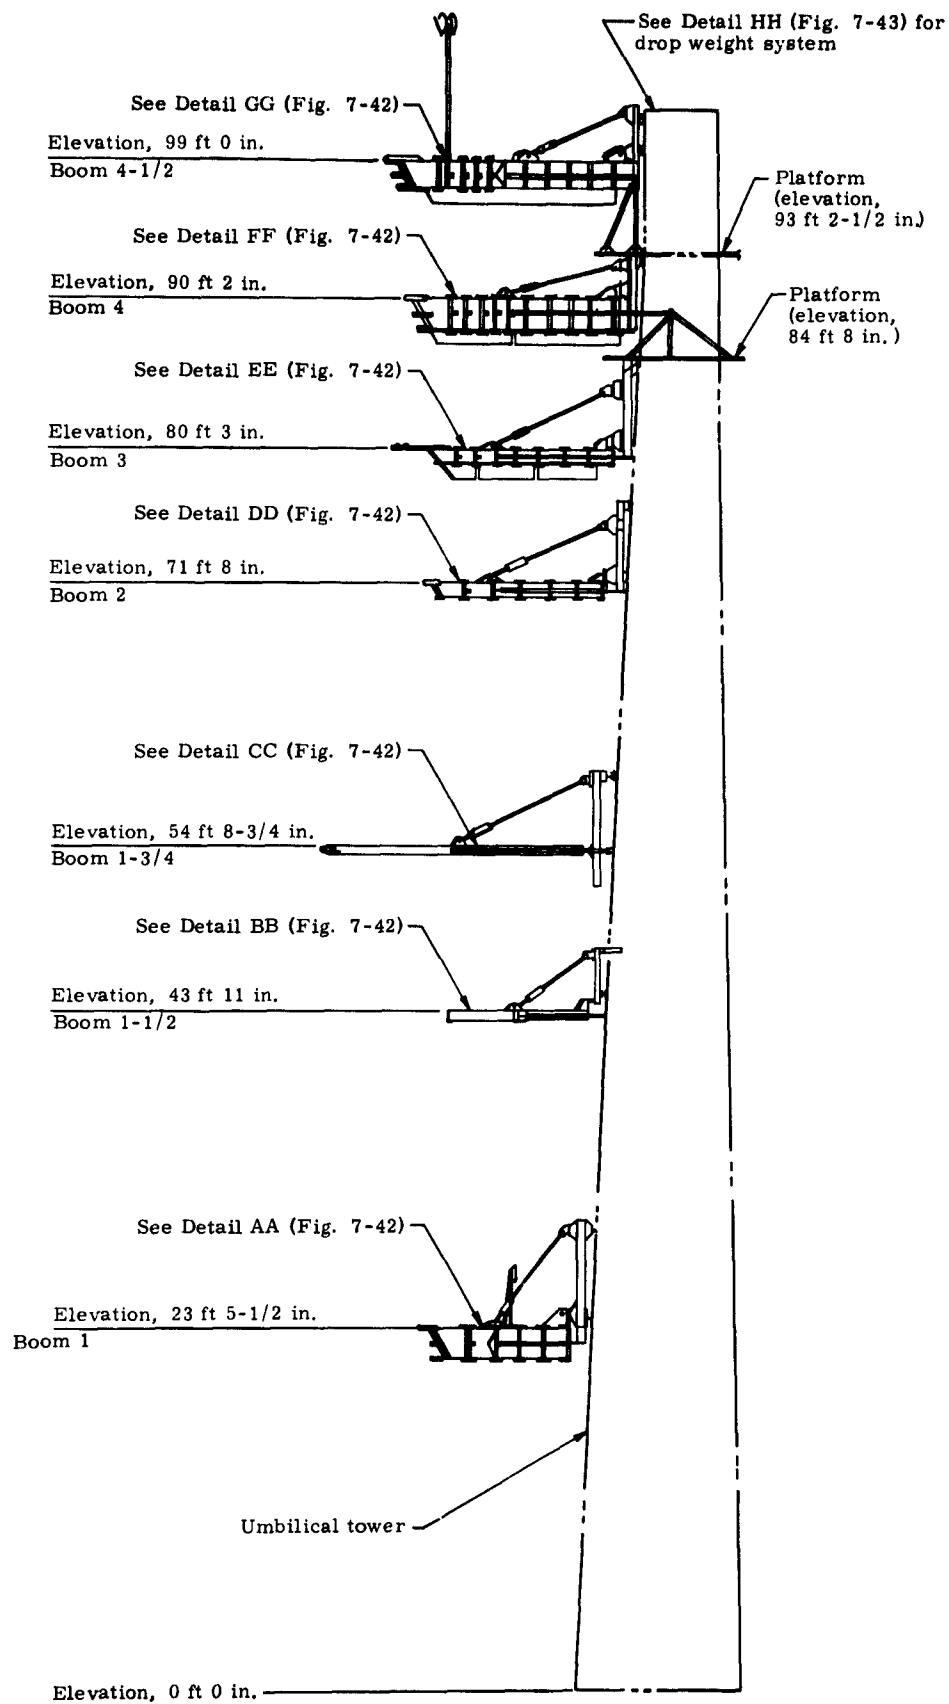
Complete Vehicle Umbilical Tower Boom Installation
